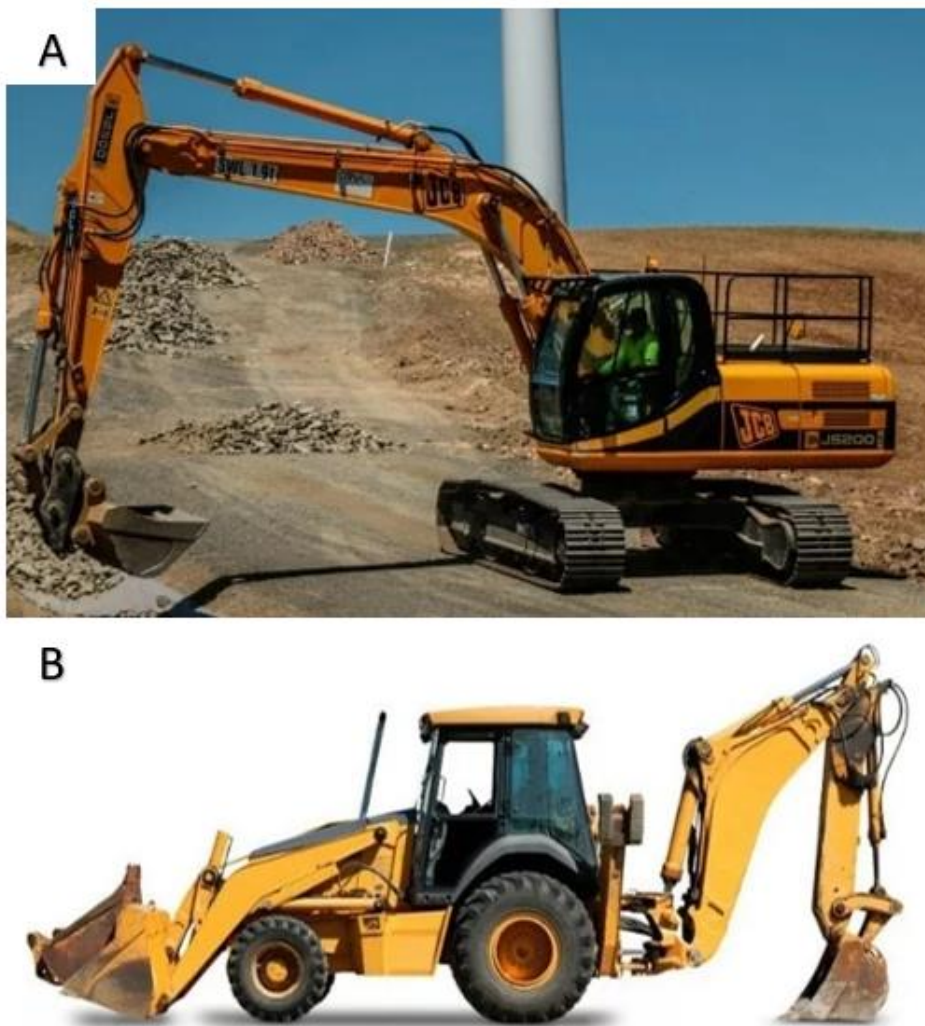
A) hydraulic excavator B) TLB (The Constructor, 2007)
